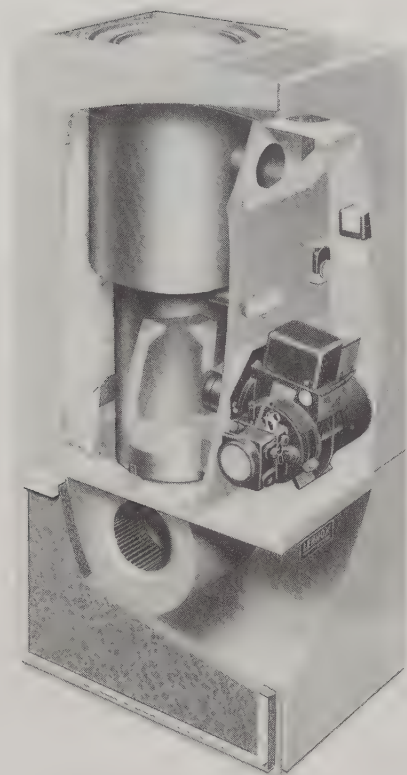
Cutaway view of a typical oil-fueled forced convection furnace. (Lennox Industries, Inc.)
